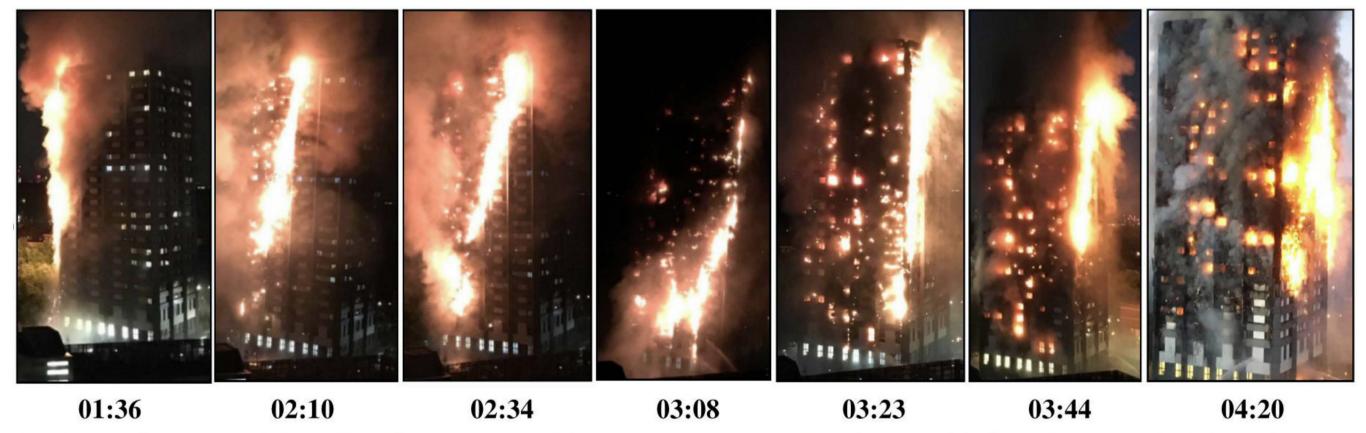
External flame front on North elevation (left) and West elevation (right) of building envelope and increasing numbers of internal fires on both building elevations, between 01:36 and 04:20 (MET00012593)
